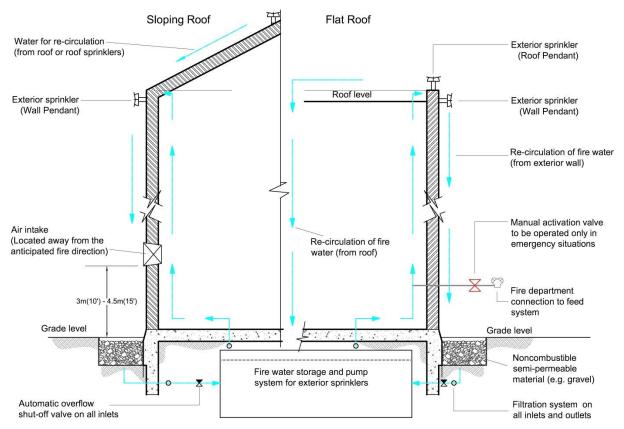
Shelter-in-place wildfire protection measures. Note: Refer to Section 2.1 for site planning overview
